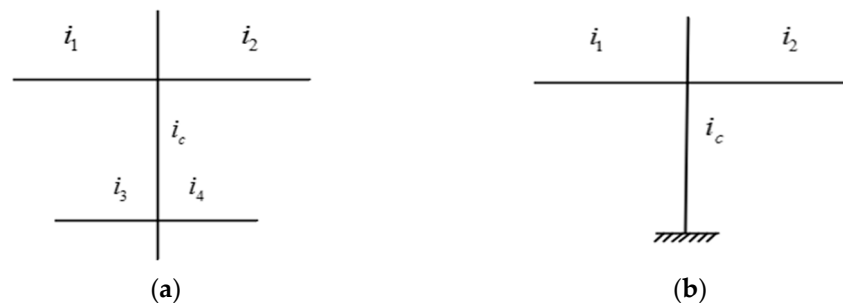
Line stiffness of components for a typical floor or ground floor: (a) typical floor; (b) ground floor.
